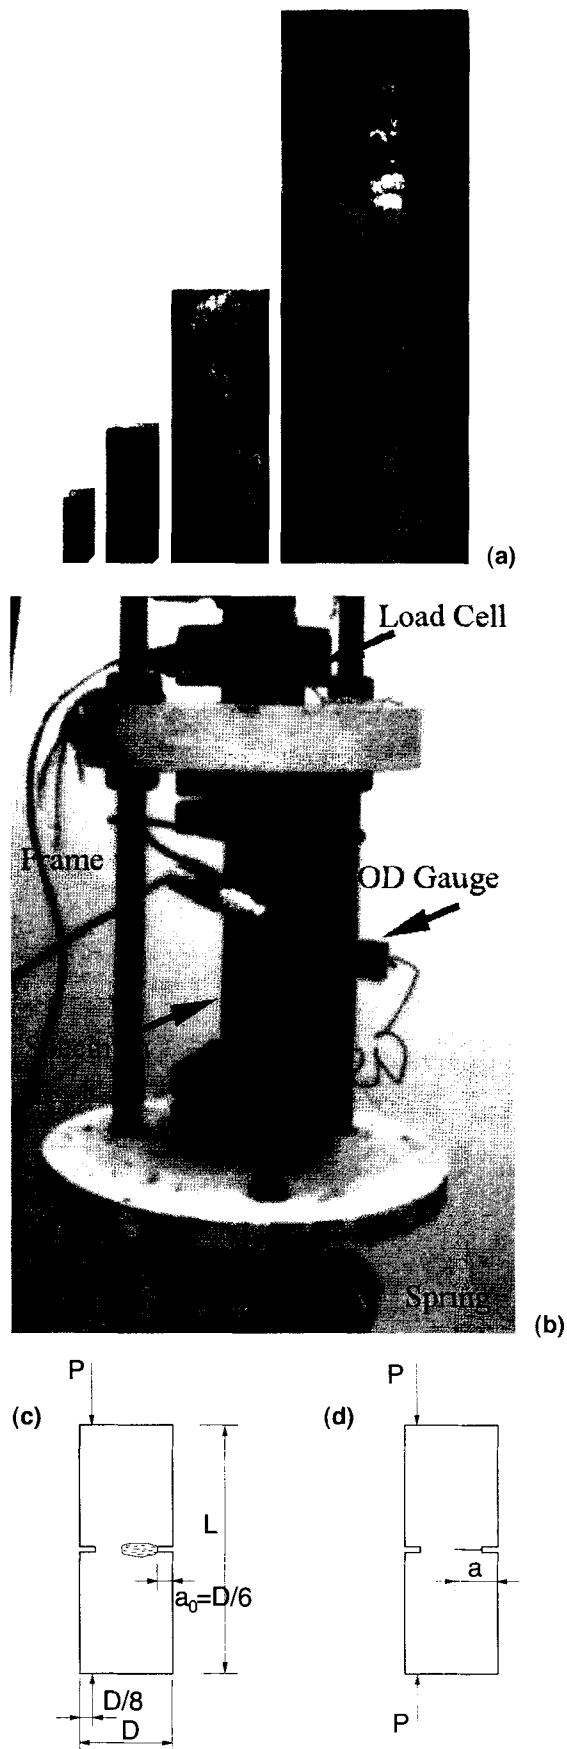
Creep Specimens: (a) Edge-Notched Fracture Specimens Tested; (b) Instrumented Specimen in Loading Frame ( $d = 3$  in.); (c) Eccentric Compression Loading and Fracture Process Zone; and (d) Equivalent Crack of Length  $a$
